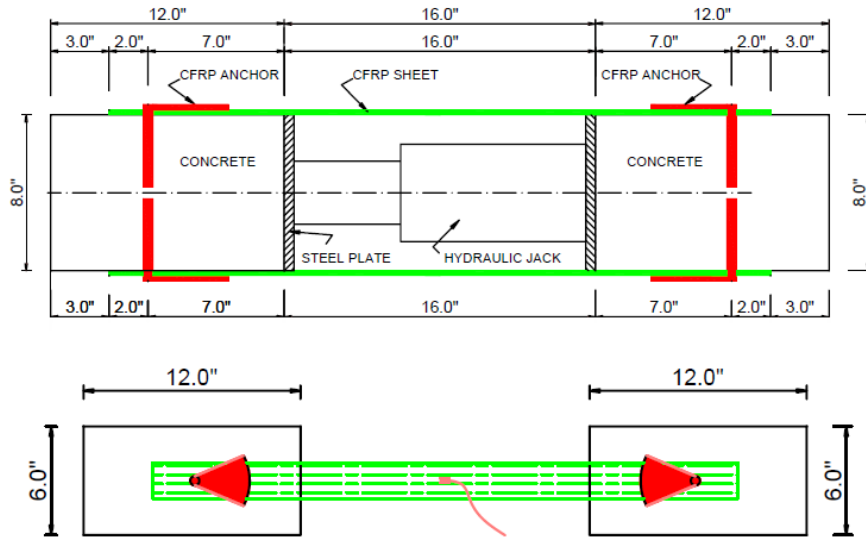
Typical test setup and two-block specimen for tension test (Pham, 2009)
